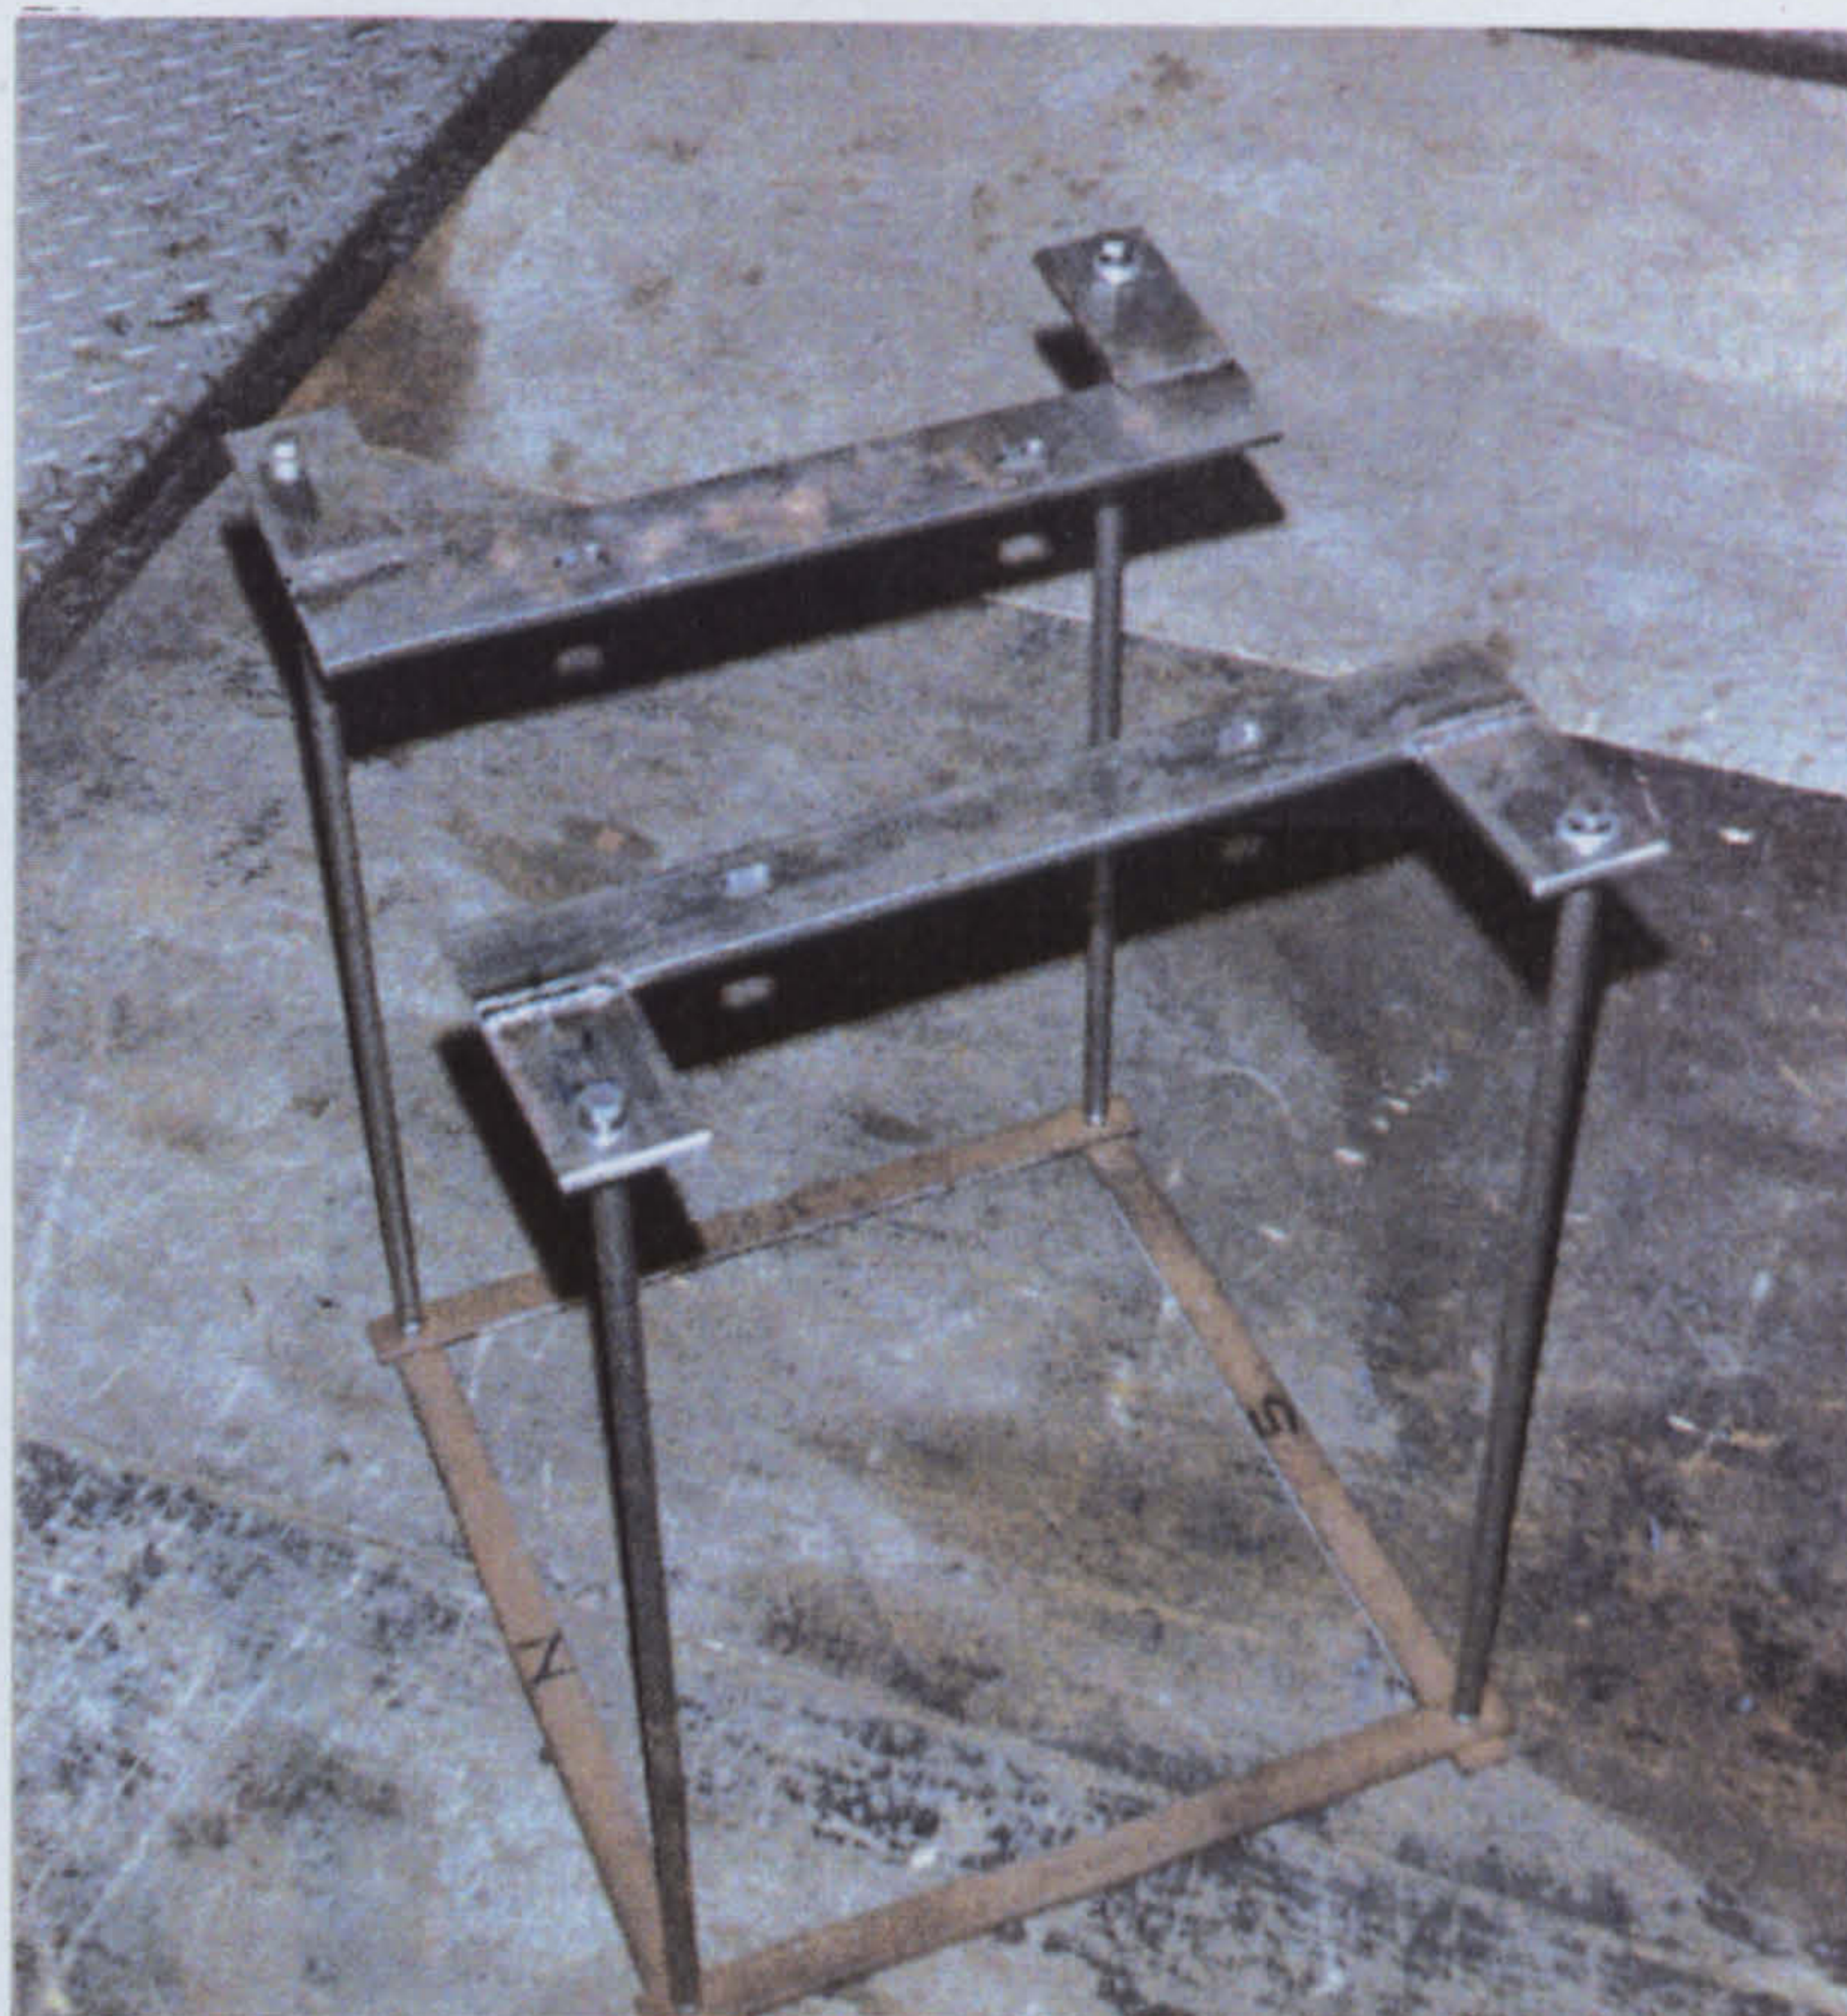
DETAILS OF THE STEEL MOUNTING FRAME USED FOR HOLDING
